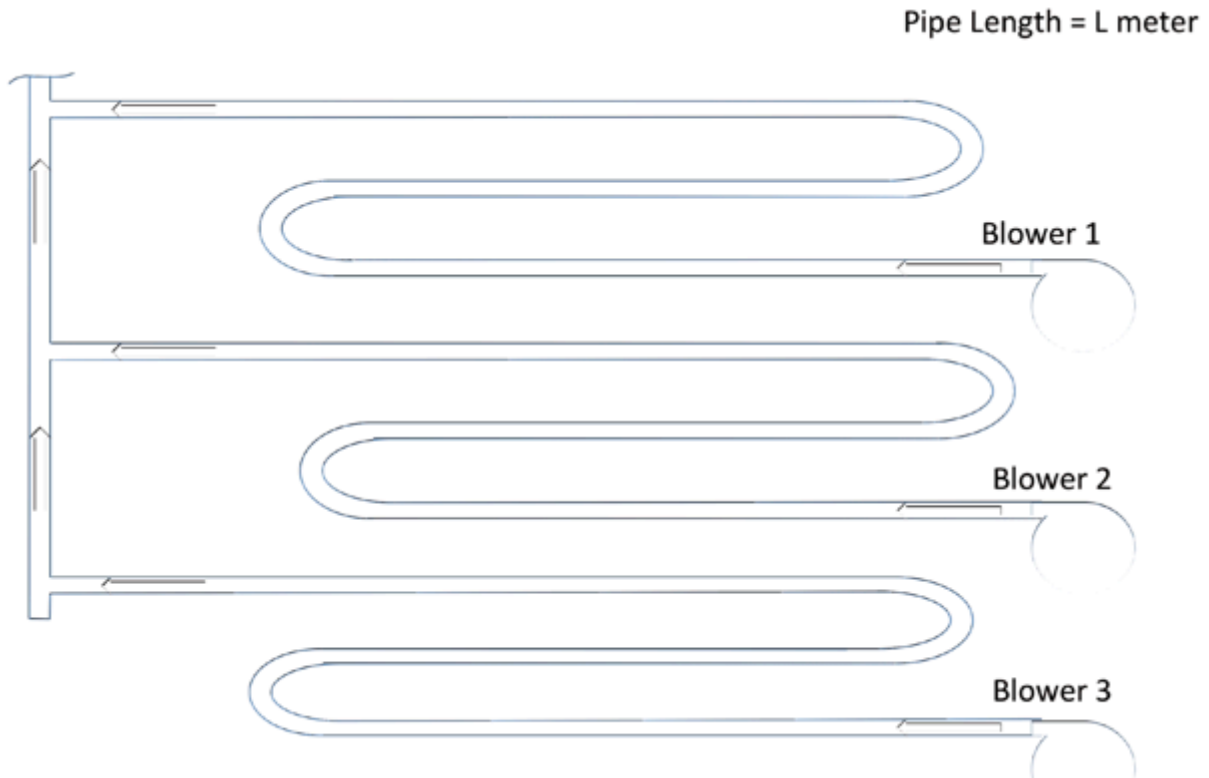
Plan view of EAHE tubes arrangement in series and parallel.
